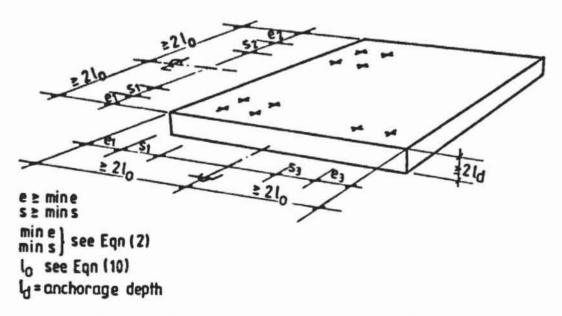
Recommended spacings of expansion anchors to prevent splitting, after (10)
